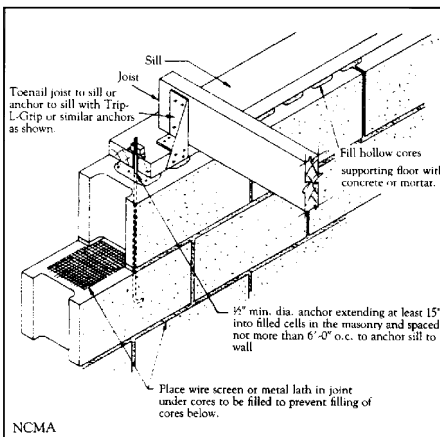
In order to distribute the loads from joists and beams, the bearing course of block should either be 4-inch-thick solid masonry, or concrete-filled hollow units, as shown. Also, joists should be securely anchored to provide lateral support to walls.
